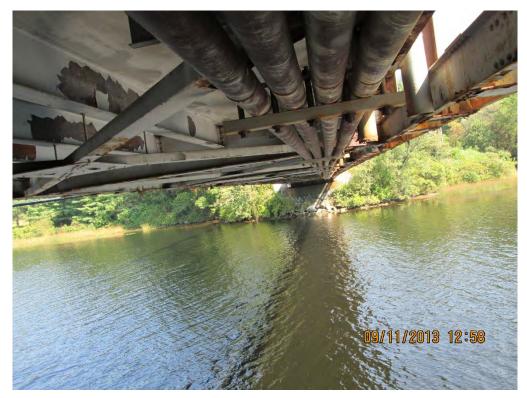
View from top of existing bridge pier looking easterly toward NH shoreline and proposed temporary trestle location adjacent to pier and temporary bank impacts during reconstruction.
